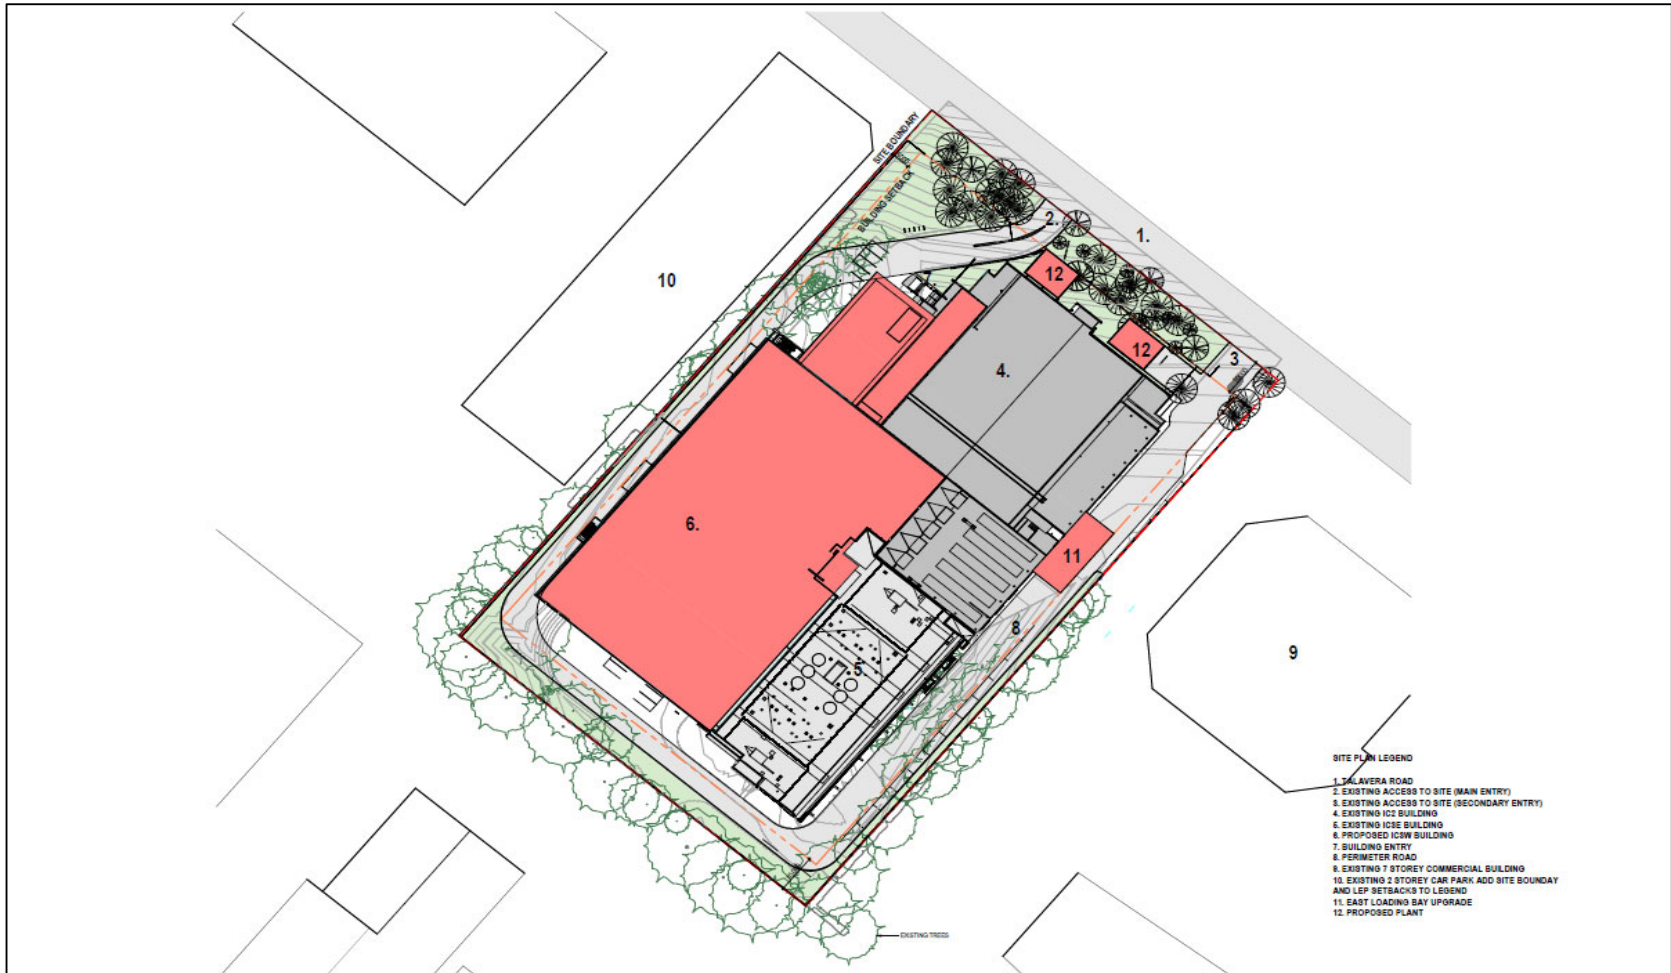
Proposed Preliminary Site Plan (Source: HDR, 2021)
